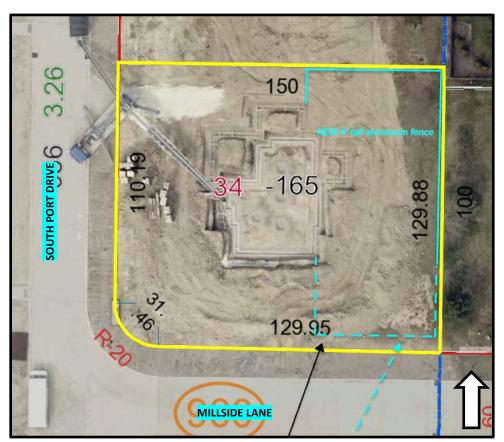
Site Plan – Applicant Provided – CAV 25-5
